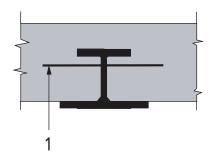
Examples of composite floor beams (BS EN 1994-1-2)
